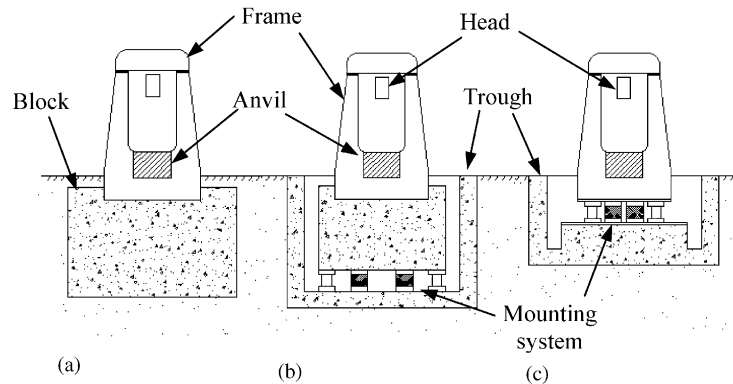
Typical configurations of the mounting systems in hammer foundations: (a) one-mass foundation, (b, c), two-mass foundation with springs and dampers.
